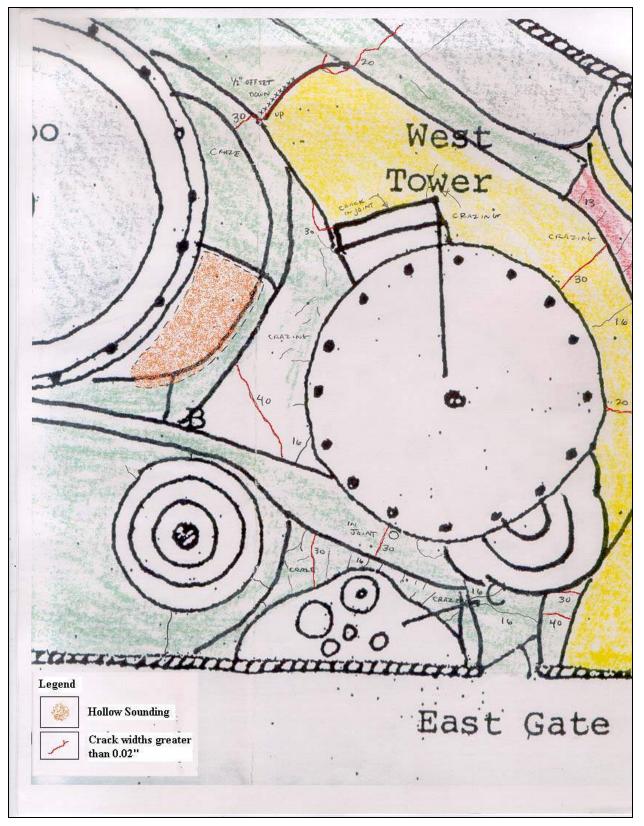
Section C -- Westerly center section (West Tower and East Gate)
